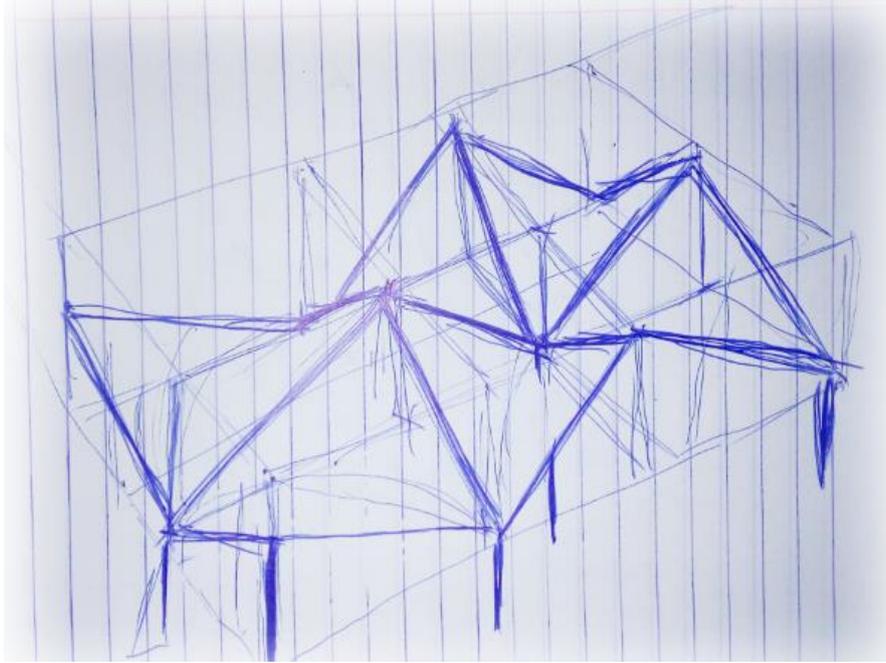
3: Initial hand sketch of the proposed structure of the building
